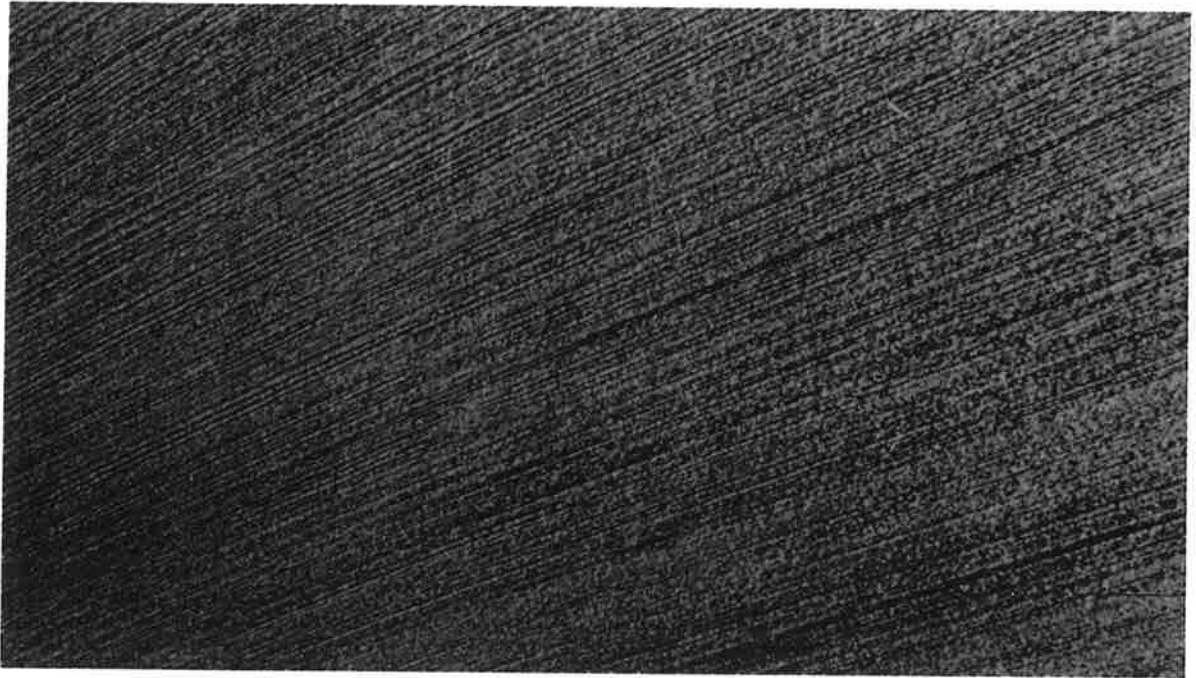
HEAVY PAVING BROOM FINISH
